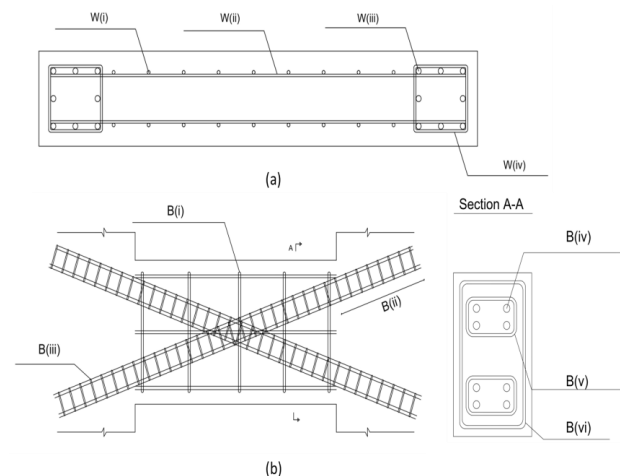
Reinforcement layout in (a) wall piers, and (b) CBs.
